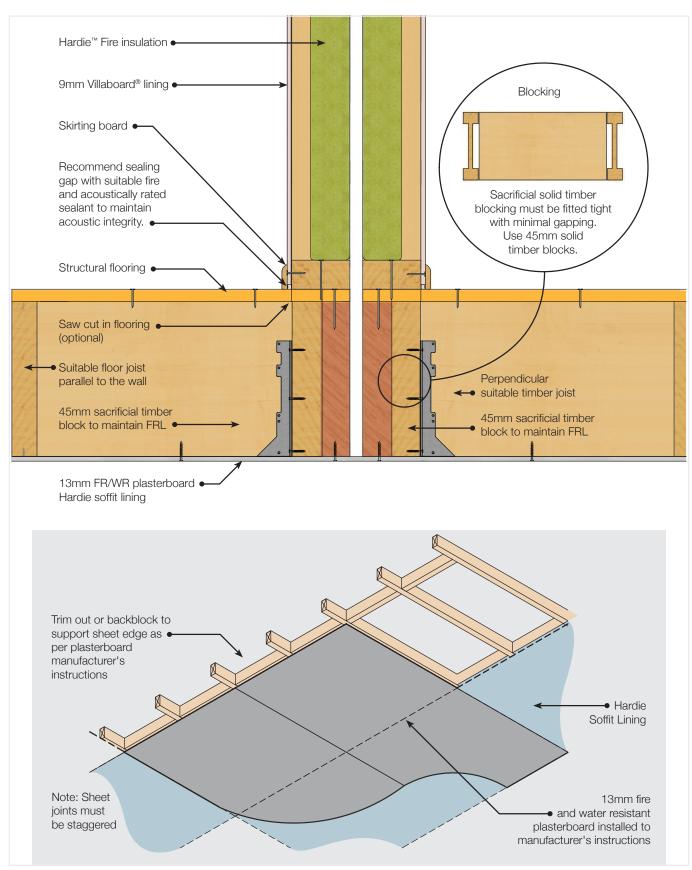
HARDIE $^{\mathsf{II}}$ SMART INTERTENANCY WALL SYSTEM WITH CANTILEVERED FLOOR
